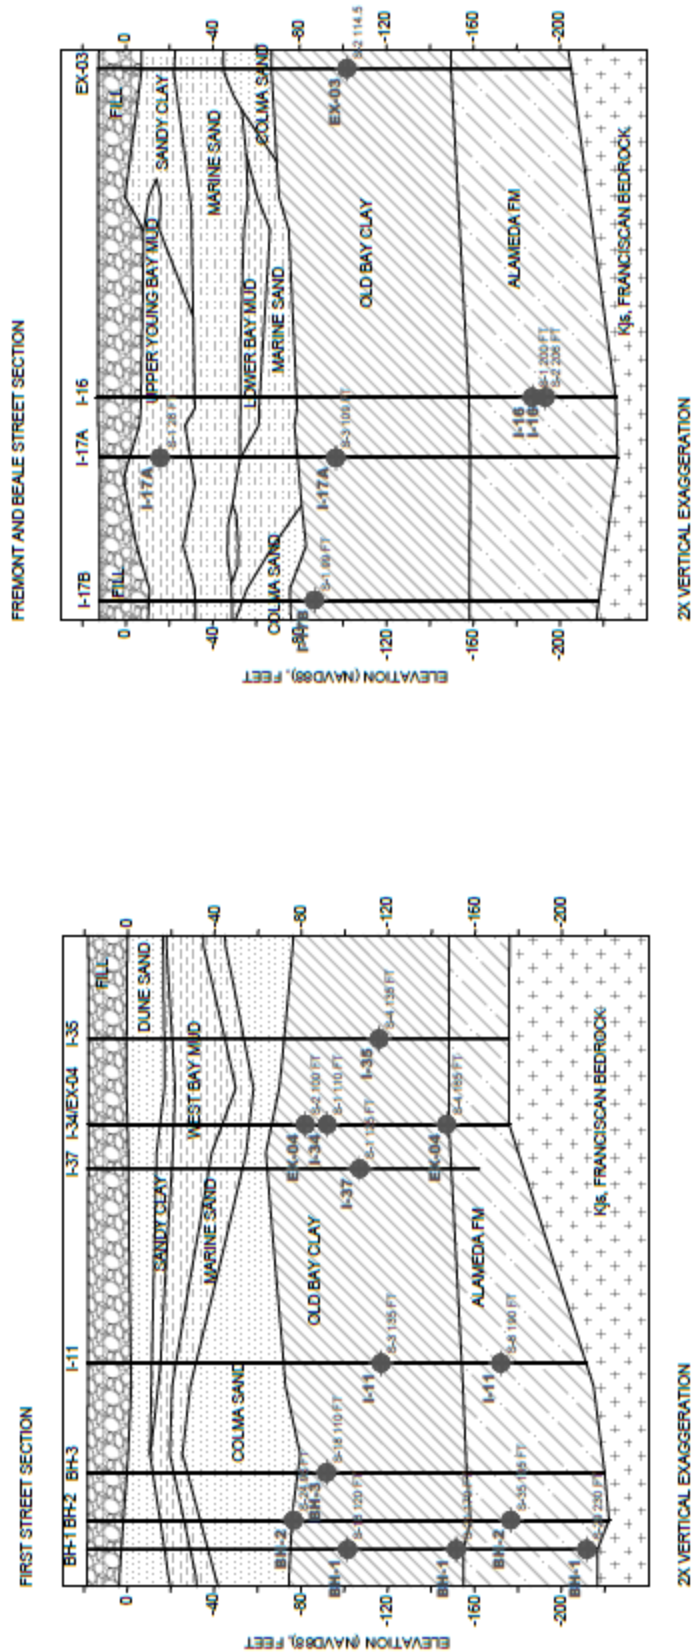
Cross sections along First Street and between Fremont and Beale Street. The left side of the sections corresponds to the west-northwest direction and the right side corresponds to east-southeast direction. Sample locations are noted. 2-times vertical exaggeration and not to scale
